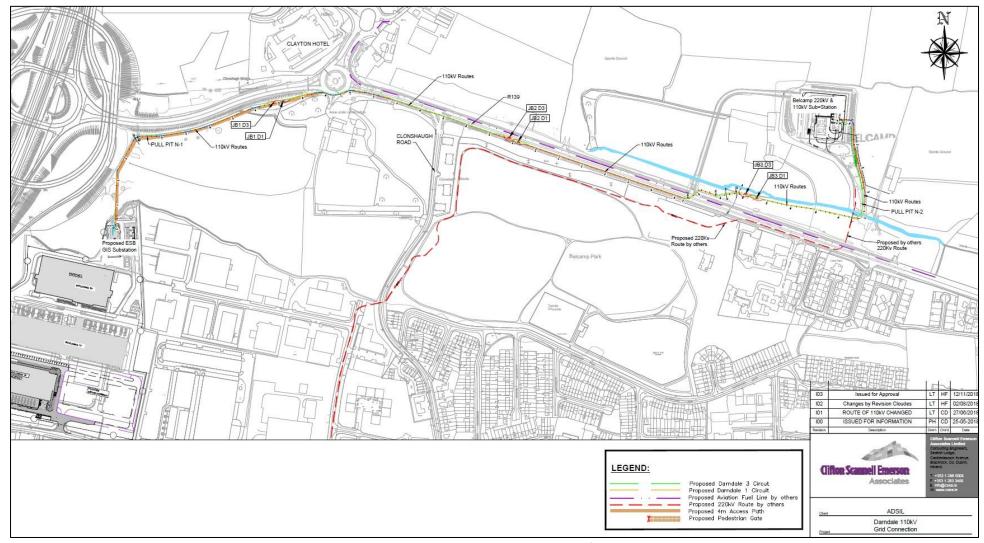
Site plan showing the site layout and proposed route of the grid connection..
